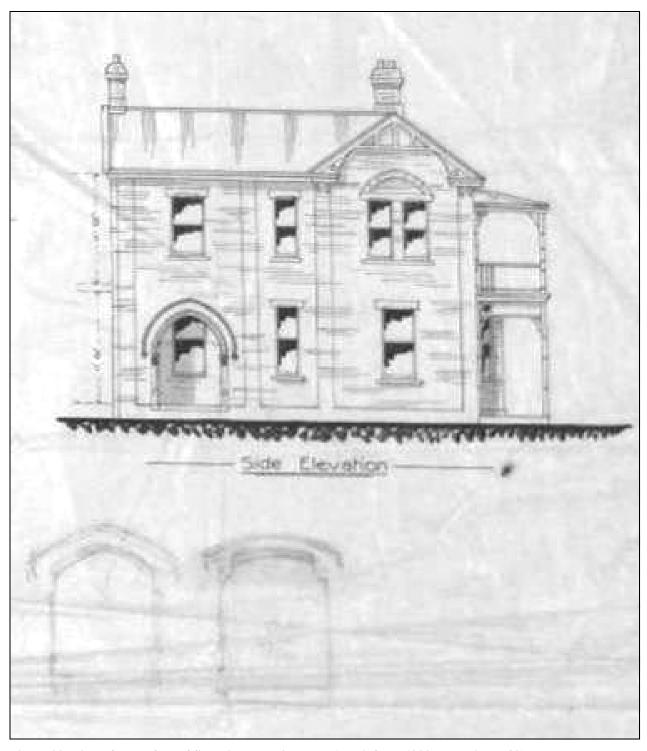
View of north face of Superintendent's House (detail from 1902 plan, Figure 89)
